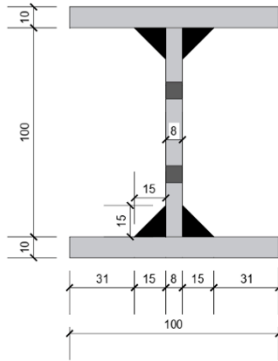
Sectional view of the configuration II, in which the steel sections are coloured in grey and the welds in black.
